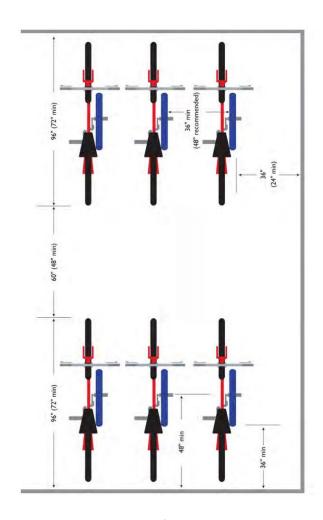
Typical Layout of a Bike Parking Area on Private Property (Source: APBP<sup>2</sup>)
